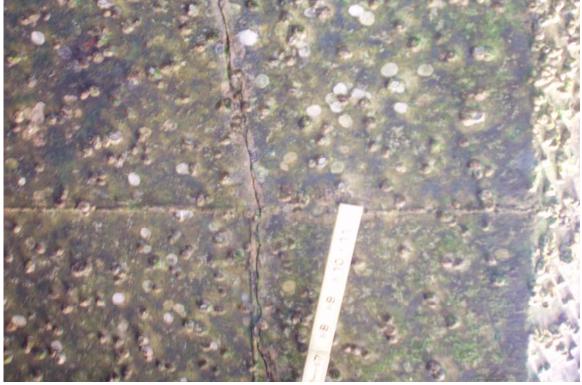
CRACKING IN UNDERSIDE OF BENT 147 PILE CAP
